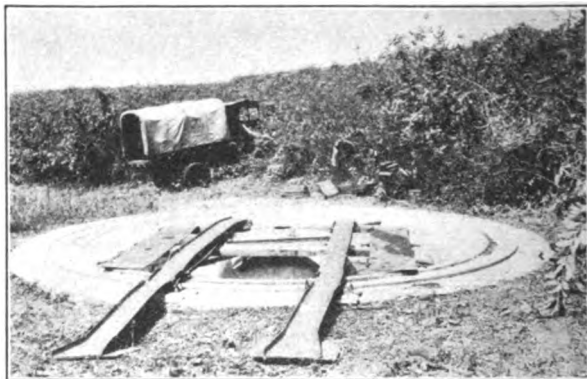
360° emplacement, pintle removed, wheel tracks, incline planes, wheel track support planks and wheel mats in place
